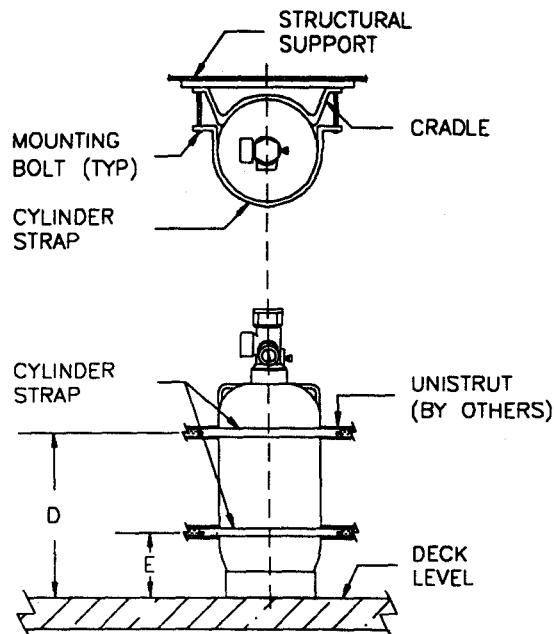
Single Cylinder Installation (see Fig. 4.11.2 for "D" & "E" dimensions).
